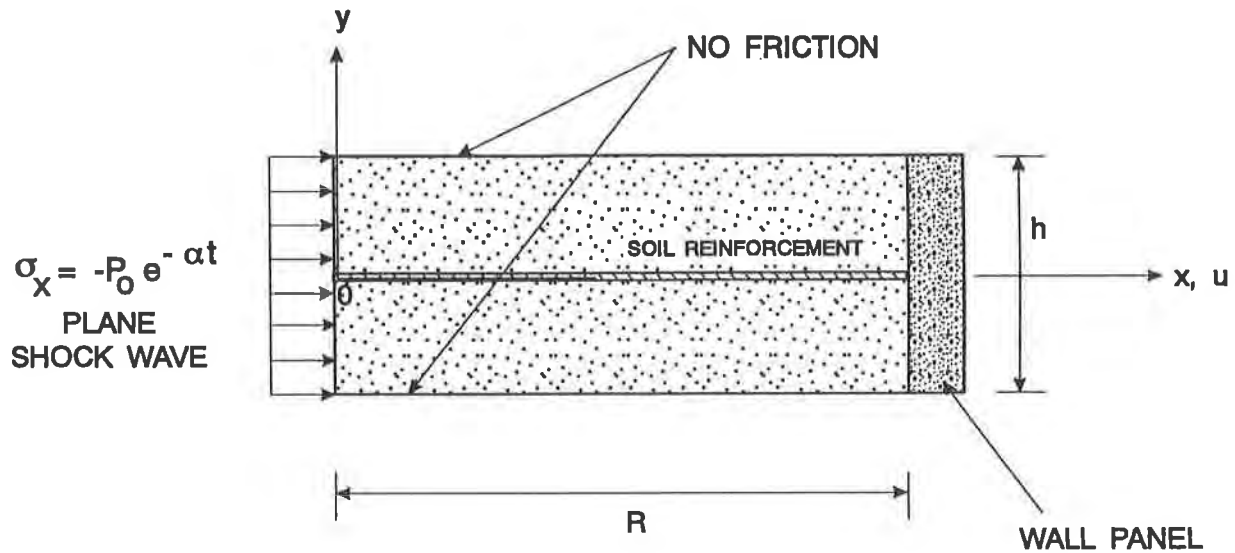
One-dimensional Model of Wall Panel and Soil Reinforcement Connection System
